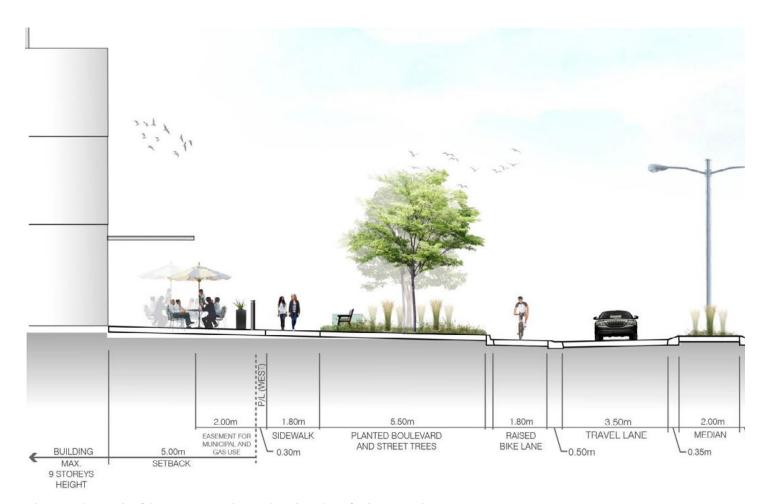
Typical Streetscape Cross-Section for Platinum Drive
